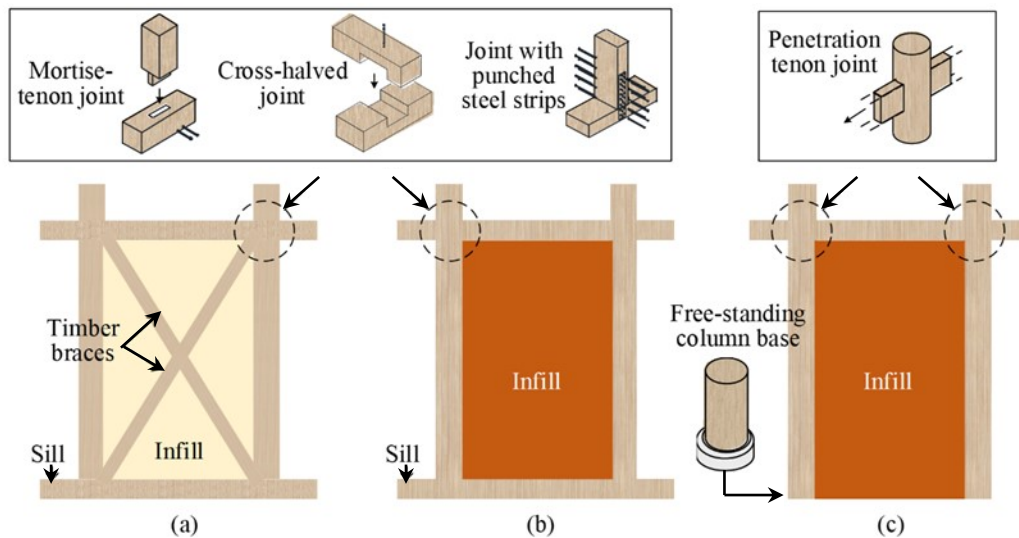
Comparison of masonry-infilled timber frame buildings: (a) braced masonry-infilled timber frame, (b) masonry-infilled timber frame, (c) Chuandou timber frame.
